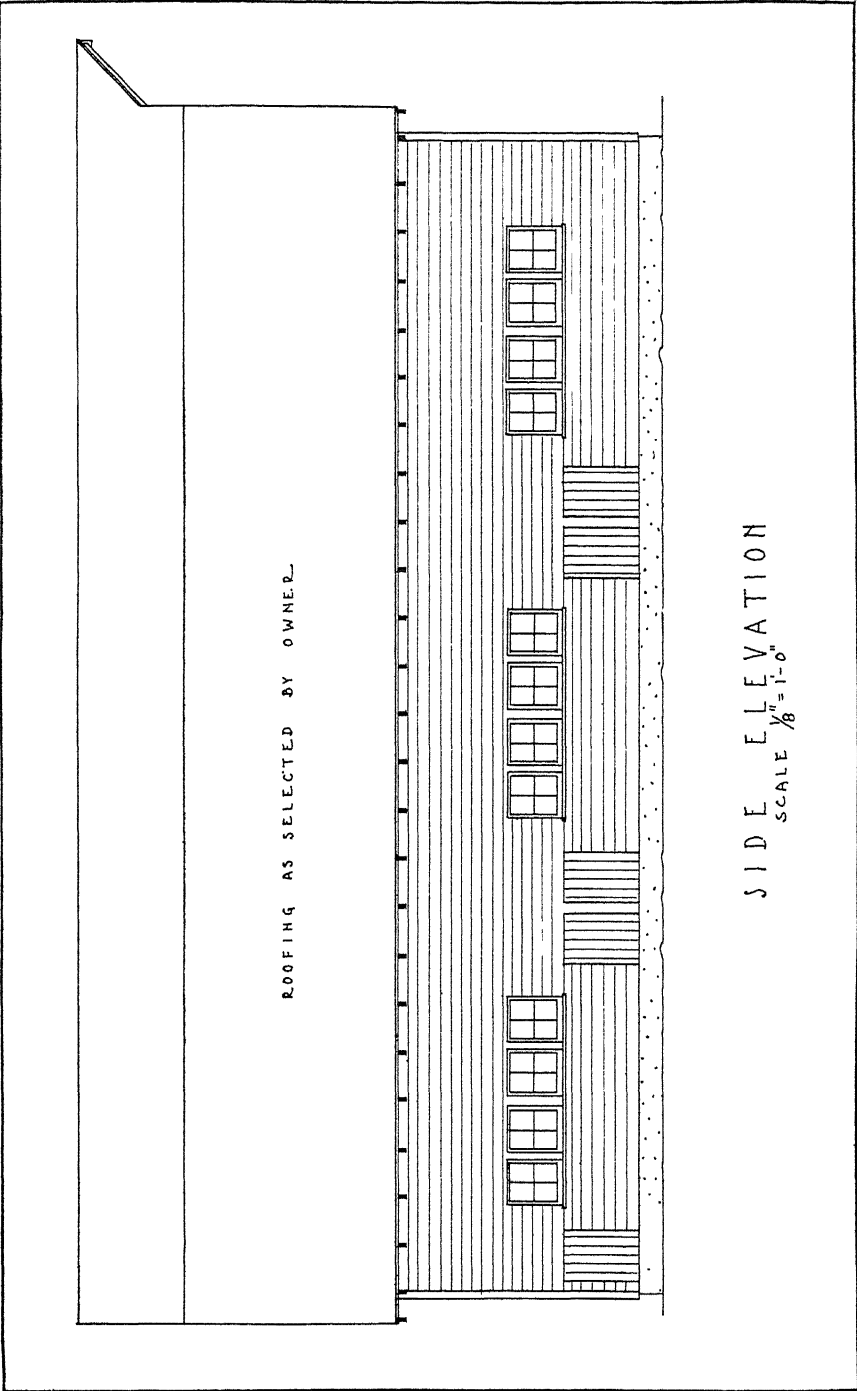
Side elevation of the gambrel roof house shown in Figs. 6 and 8.
